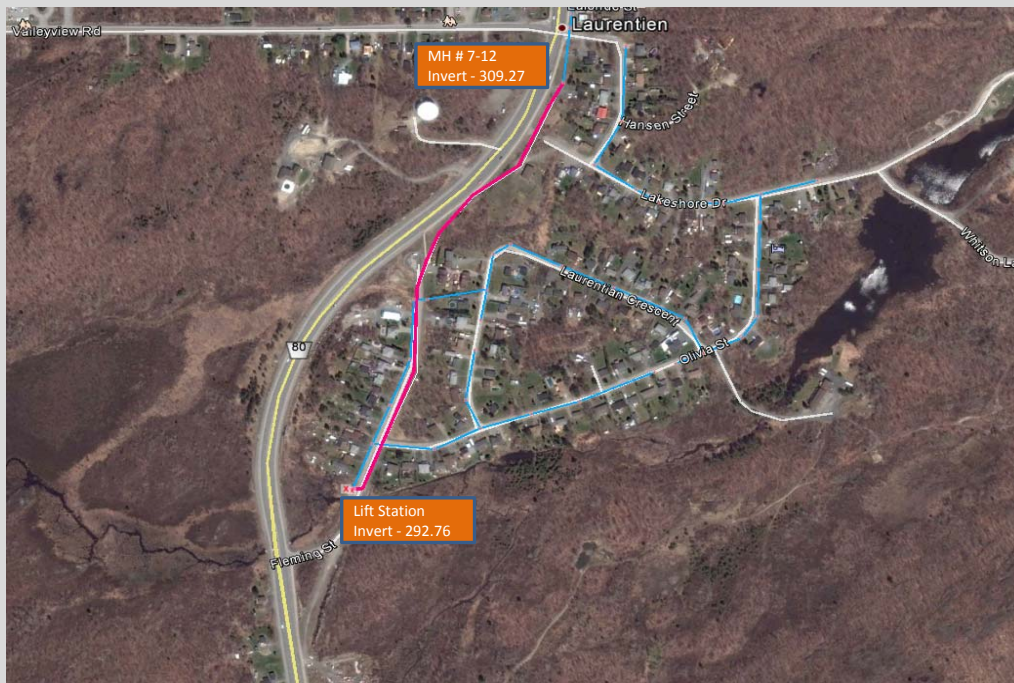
Manhole location and invert elevations surrounding Fleming Pumping Station
